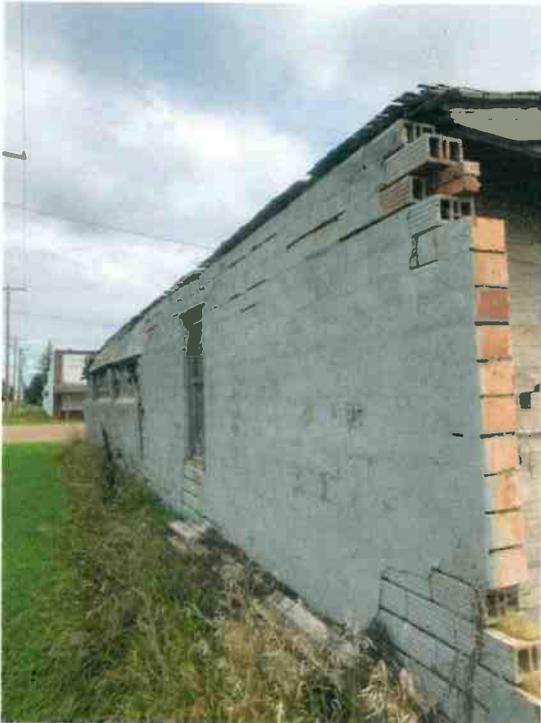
Implement Dealership- Exterior photo of the west side of the building
